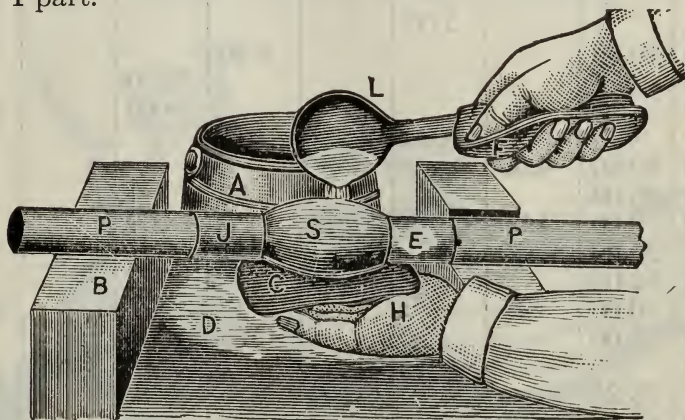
,434.—Method of wiping a horizontal joint. The cloth used for wiping is a pad of moleskin or fustian about four inches square made from a piece twelve inches by nine, folded six times, and sewed to keep it from opening; the side next the pipe is saturated with hot tallow when used. If the lead has been brought to the heat of the solder, and the latter properly manipulated and shaped while in a semi-fluid or plastic condition, the joint gradually assumes the finished egg shaped appearance. In making the joint a quantity of solder is taken from the pot by means of the ladle, the solder being previously heated so hot that the hand can be kept within two inches of its surface. The solder is poured lightly on the joint, the ladle being moved backwards and forwards, so that too much solder is not put in one place. The solder is also poured an inch or two on the soiling, to make the pipe of proper temperature. Naturally the further the heat is run or taken along the pipe, the better the chance of making the joint. The operator keeps pouring and with the left hand holds the cloth to catch the solder, and also to cause the same to tin the lower side of the pipe, and to keep the solder from dropping down. By the process of steady pouring the solder now becomes nice and soft and begins to feel shaped, firm and bulky. When in this shape and in a semi-fluid condition the ladle is put down, and, with the left hand, the operation of wiping, as illustrated, is begun working from the soiling towards the top of the bulb. If the lead cool rapidly, it is reheated to a plastic condition by a torch, or a heated iron. When the joint is completed, it is cooled with a water spray, so that the lead shall not have time to alter its shape.
